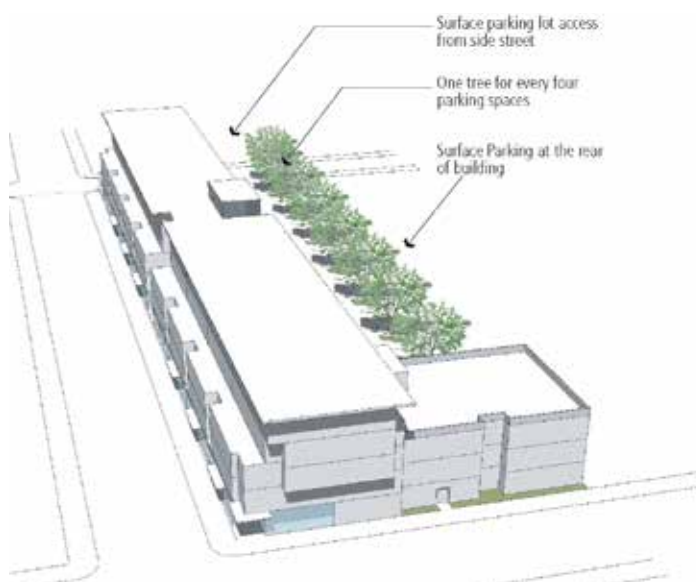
Typical Parking Orientation -- Surface parking is located within the block with access from Secondary Streets
